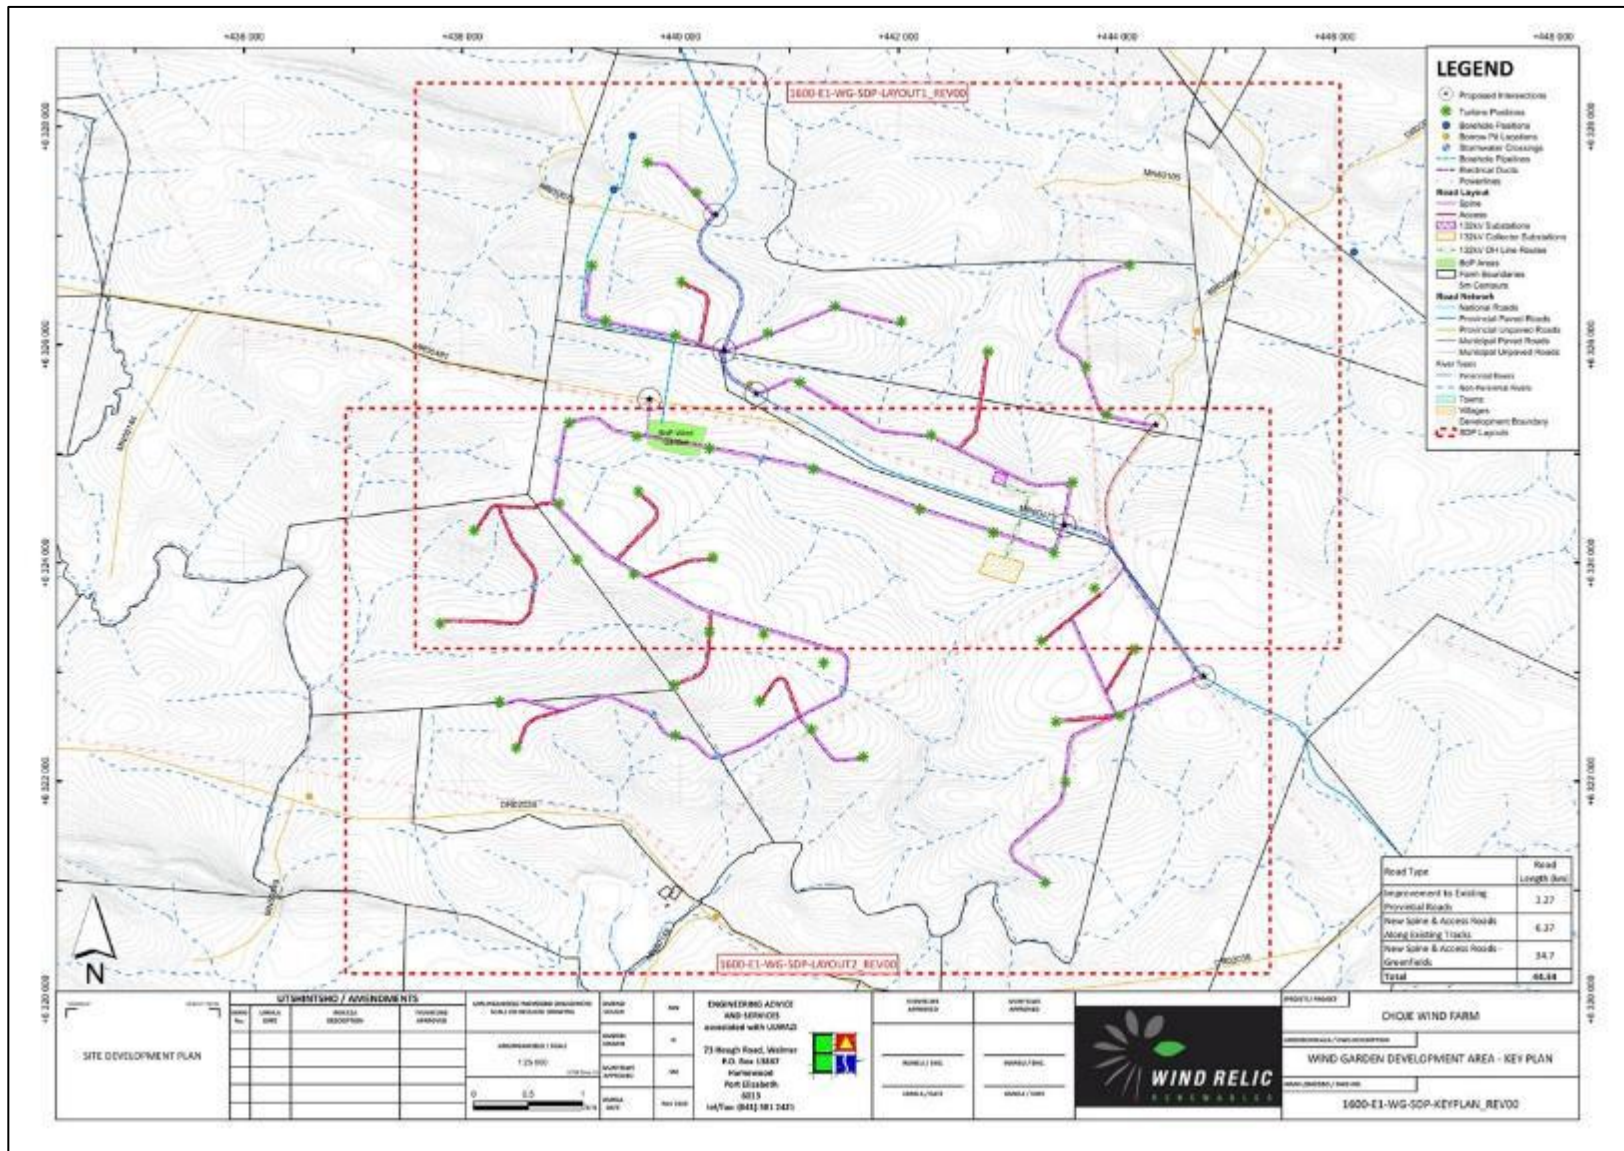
Wind Garden Wind Farm Site Development Plan (Provided by WindRelic).
